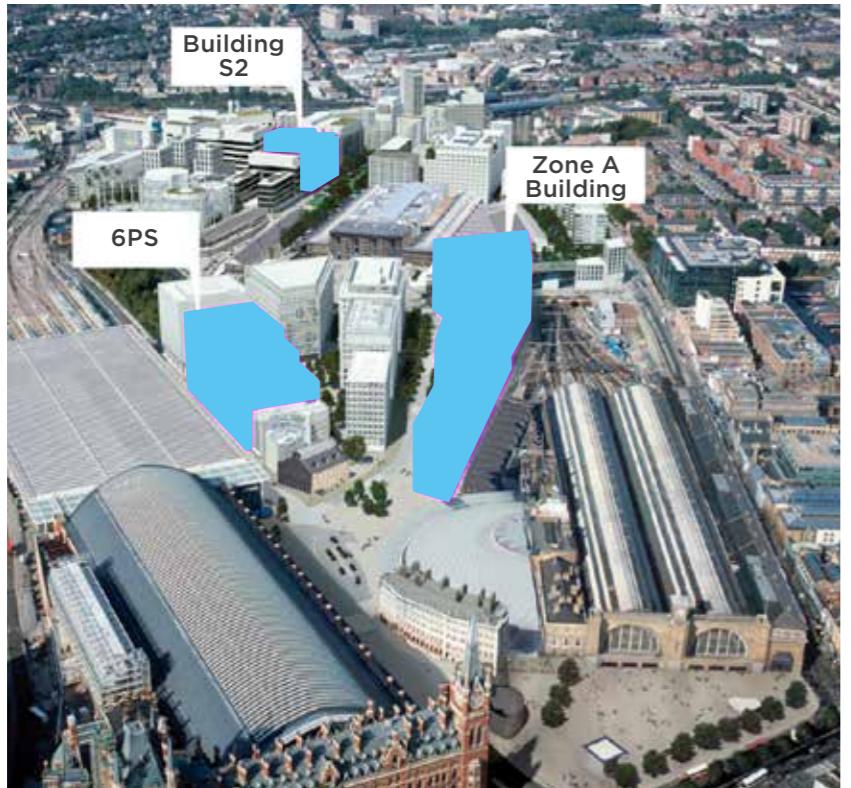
Aerial photograph as seen from the south at Development Zone A, showing the location of the proposed Zone A Building and Building S1 and Six Pancras Square
